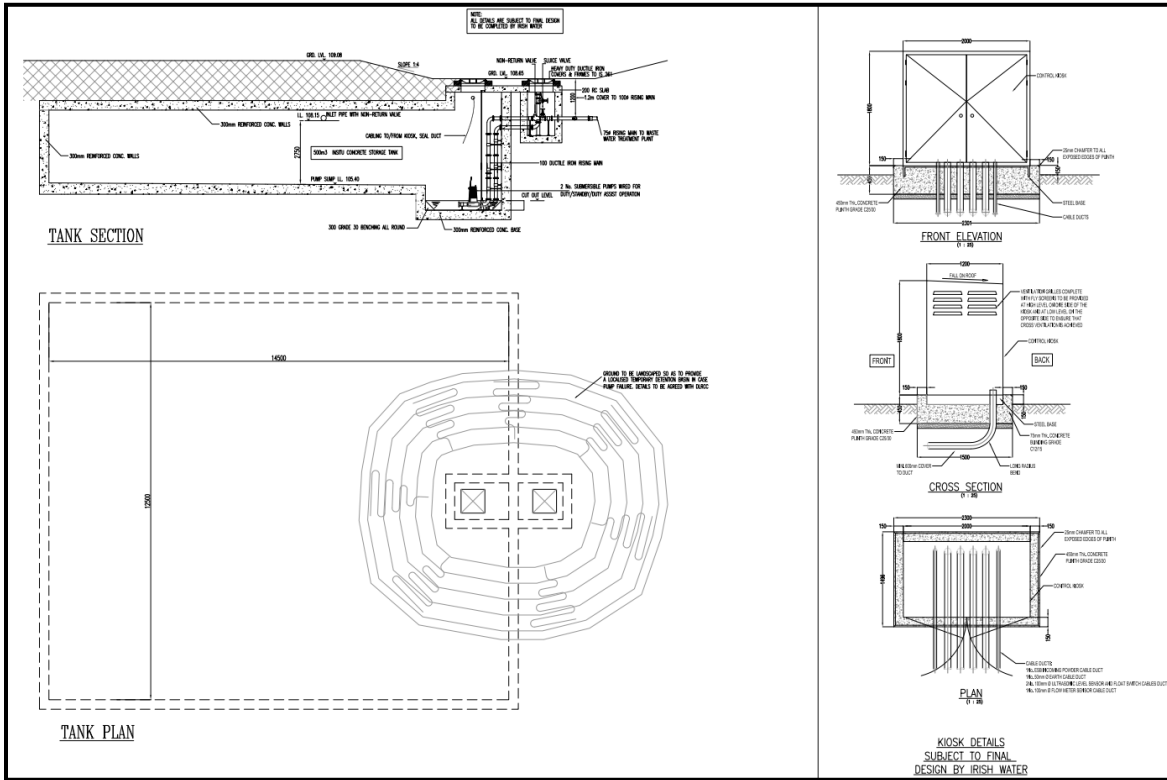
Proposed attenuation tank design layout (Source: Kavanagh Burke Consulting Engineers).
